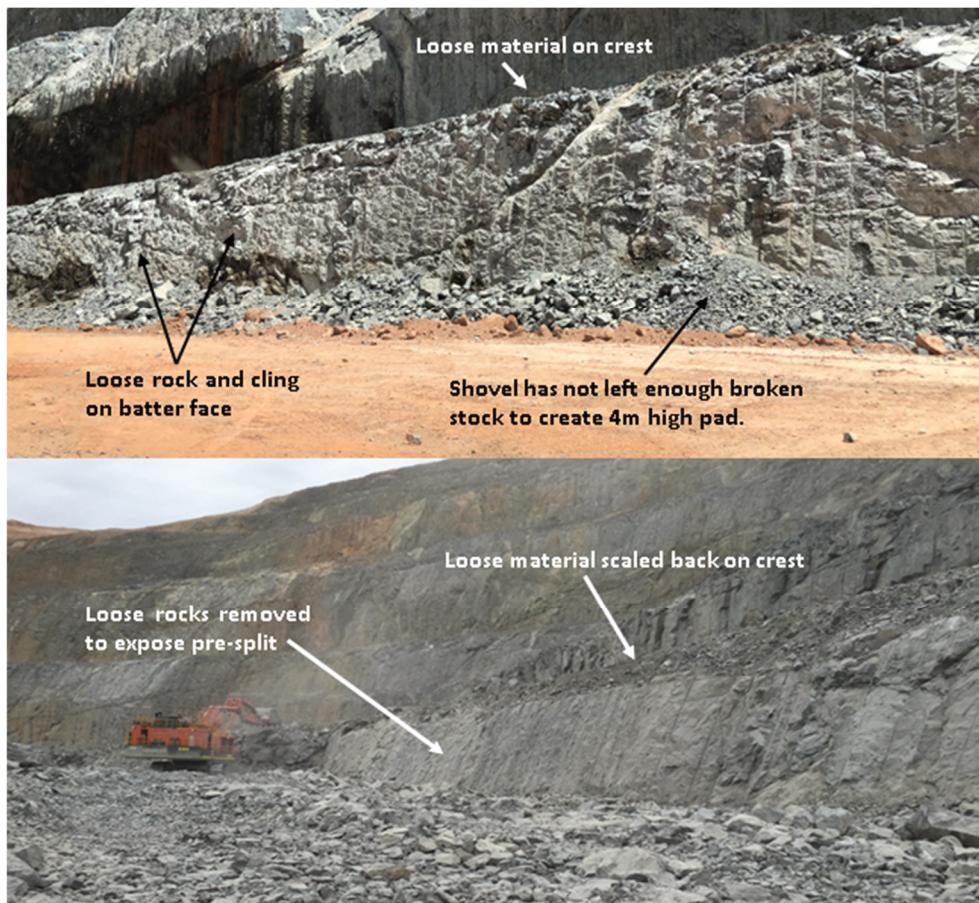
Examples of top flitch walls before and after scaling with an excavator
